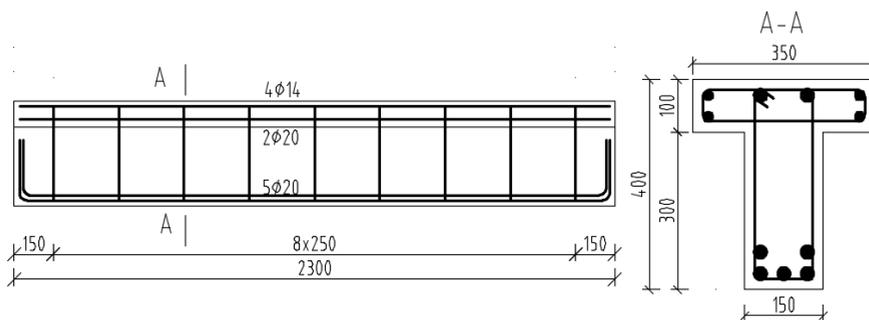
The scheme of steel reinforcement and cross-section of beams.
